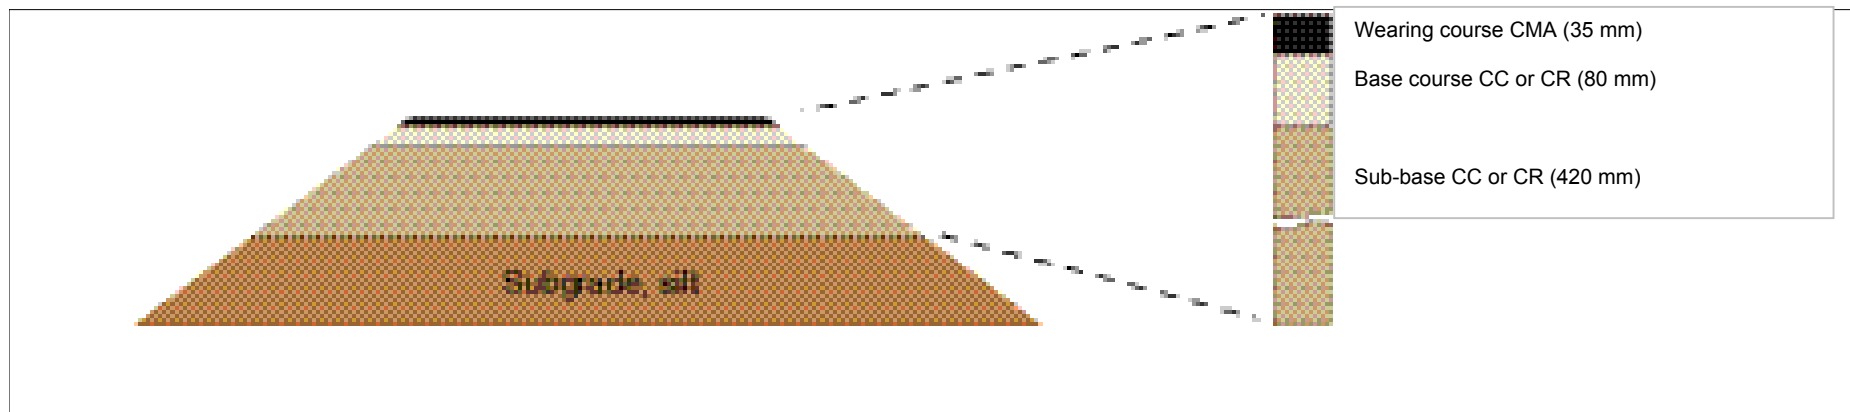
Soil replacement of Rd 597: Pavement strata of a test section and a reference section
